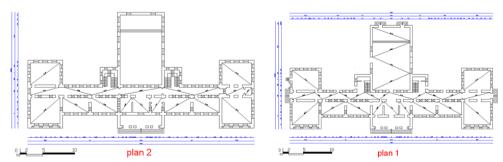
First Floor and Second-floor Plans (Source: Building Restoration Plan, 2013)
